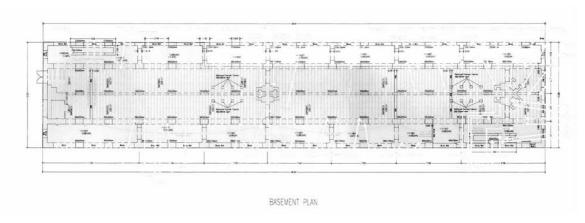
2013 Basement record framing plan. (Source: Architectural Services Department, Structural Appraisal Report 2013)
